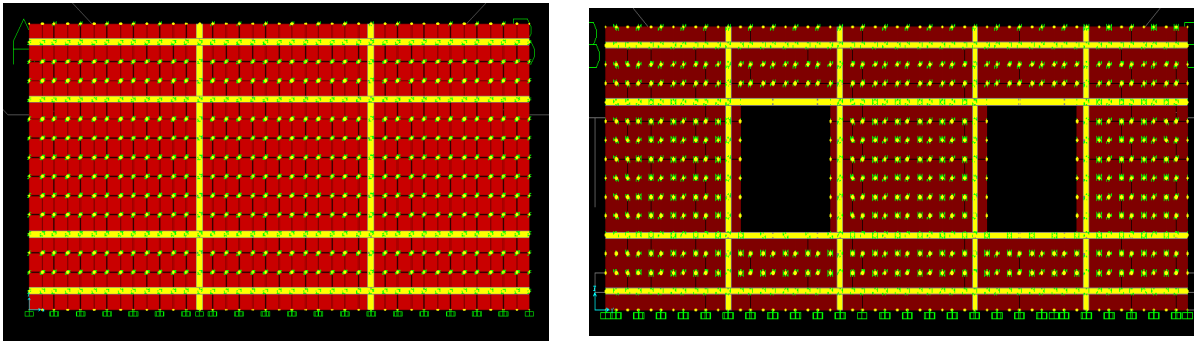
View of 3-D modelled walls with metal strips – short direction wall (left) long direction wall (right)
